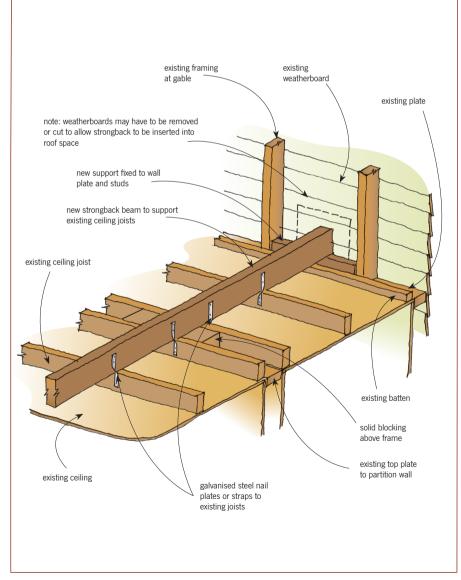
Strongback and new structure added to an existing ceiling to remove deflection in original framing.
